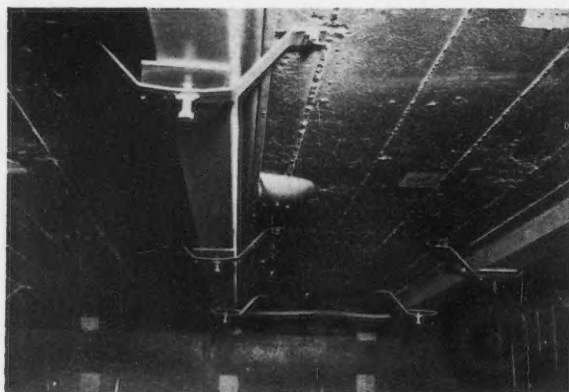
Wetting units attached to underside of bridge deck to add capillary water to the concrete.
